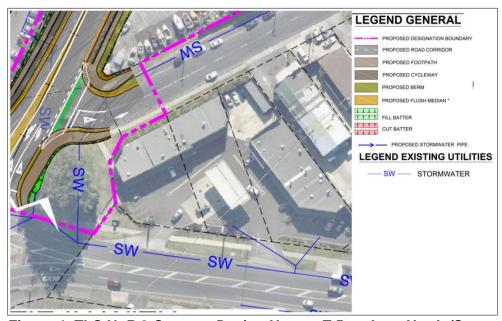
TLC NoR 2 Concept Design Next to Z Papakura North (Source: TLC NoR 2 General Arrangement Plan)
